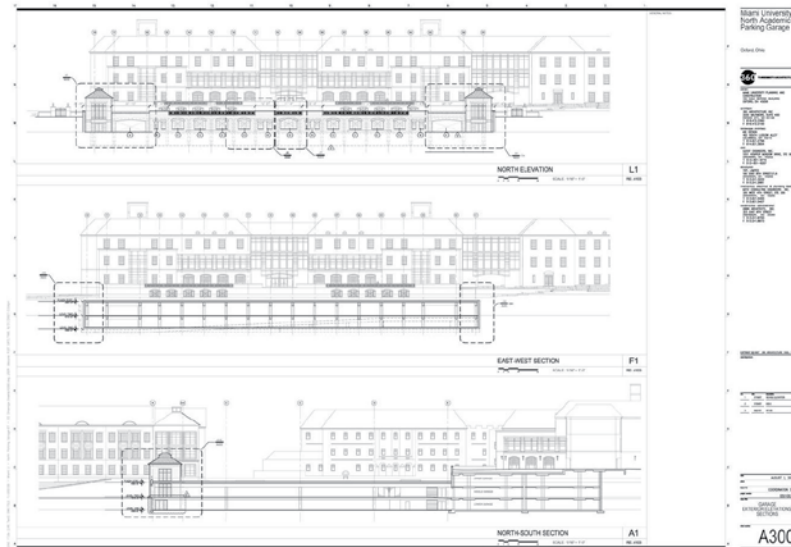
North/South section by 360 Architects. Note the elevation transition at intermediate level.
